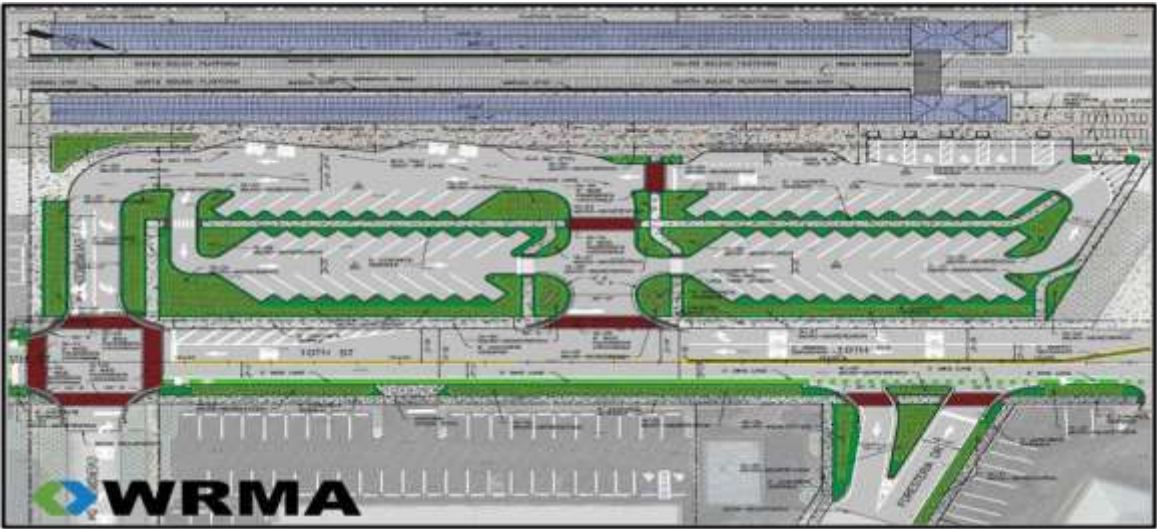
Proposed Tri-Rail Station Concept at 10th Street
